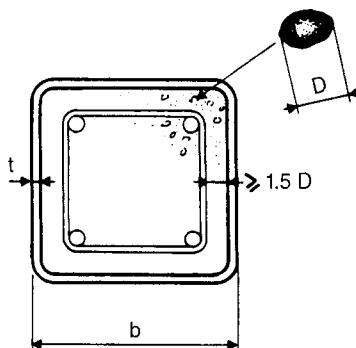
Concrete cover for the reinforcement bars in concrete filled hollow section columns
